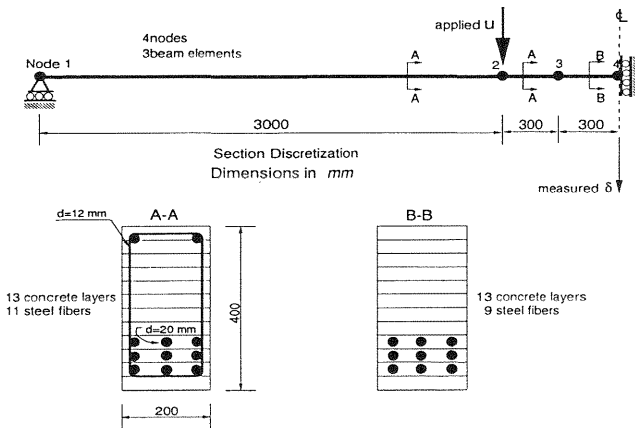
FE mesh of over-reinforced concrete beam & section discretization into layers.
